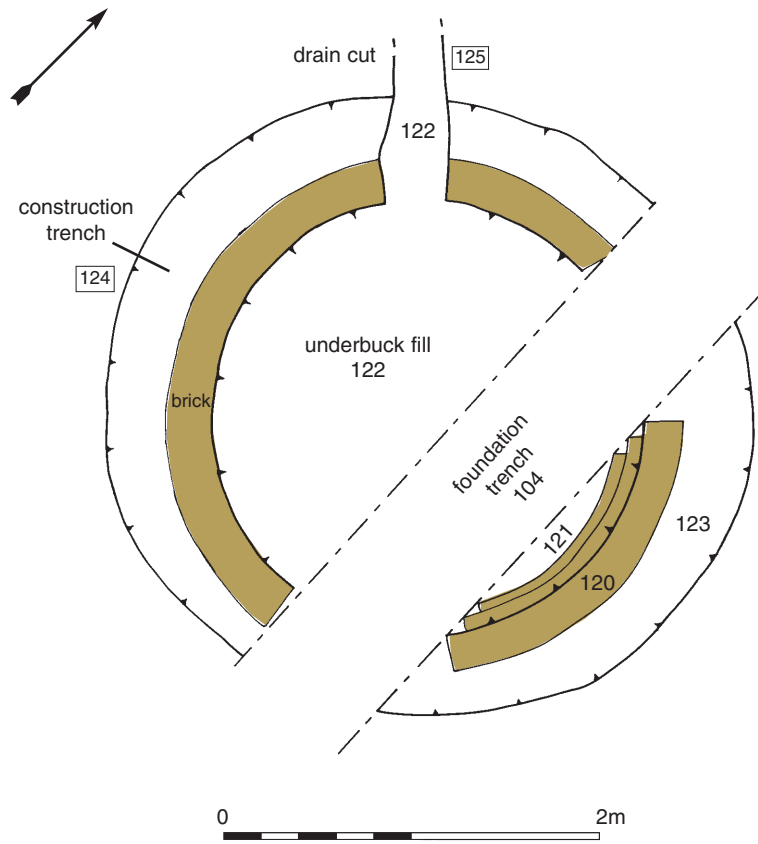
Plan of Structure 119 as excavated, scale 1:20
